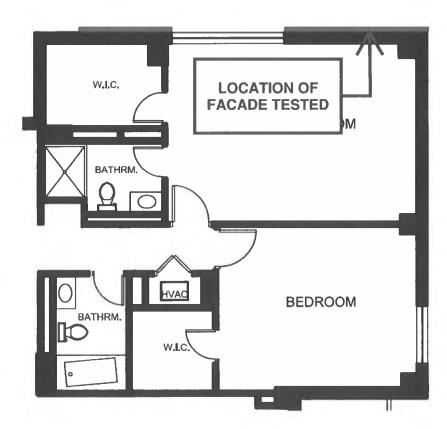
Plan View of Location and Extent of Water Testing of the North Wall of Unit 4-1202
